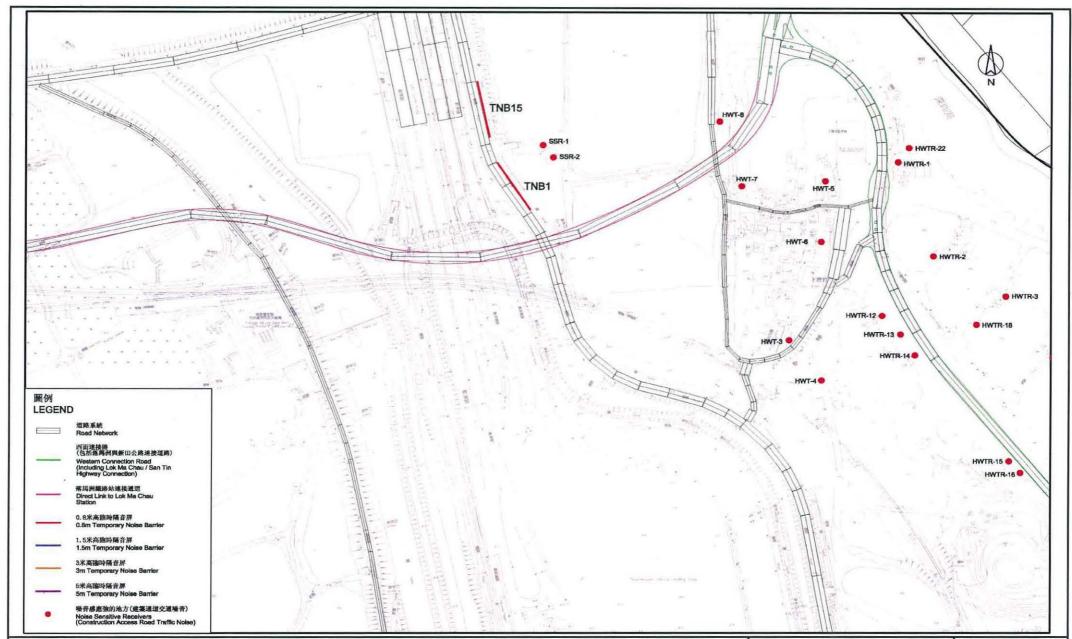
Extents and Locations of Construction Stage Temporary Noise Barriers Before the Commencement of Road Widening Works of the Western Connection Road at the Existing Lok Ma Chau Road (Sheet 1 of 2)
